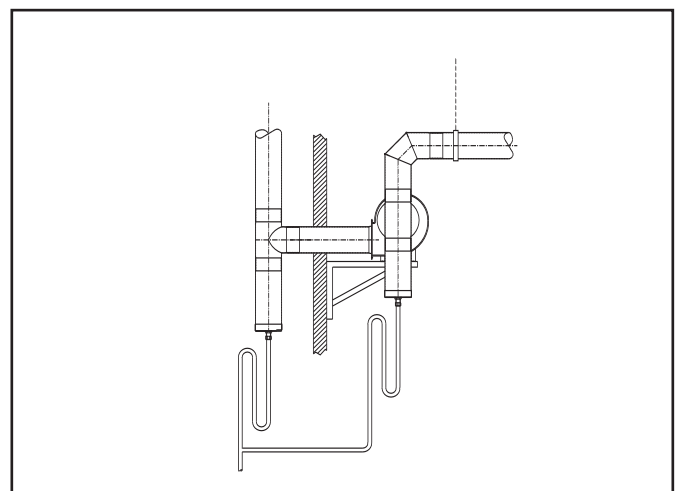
Stainless steel telescopic through the wall arrangement (available for Type '0' and Type '2' fans)
